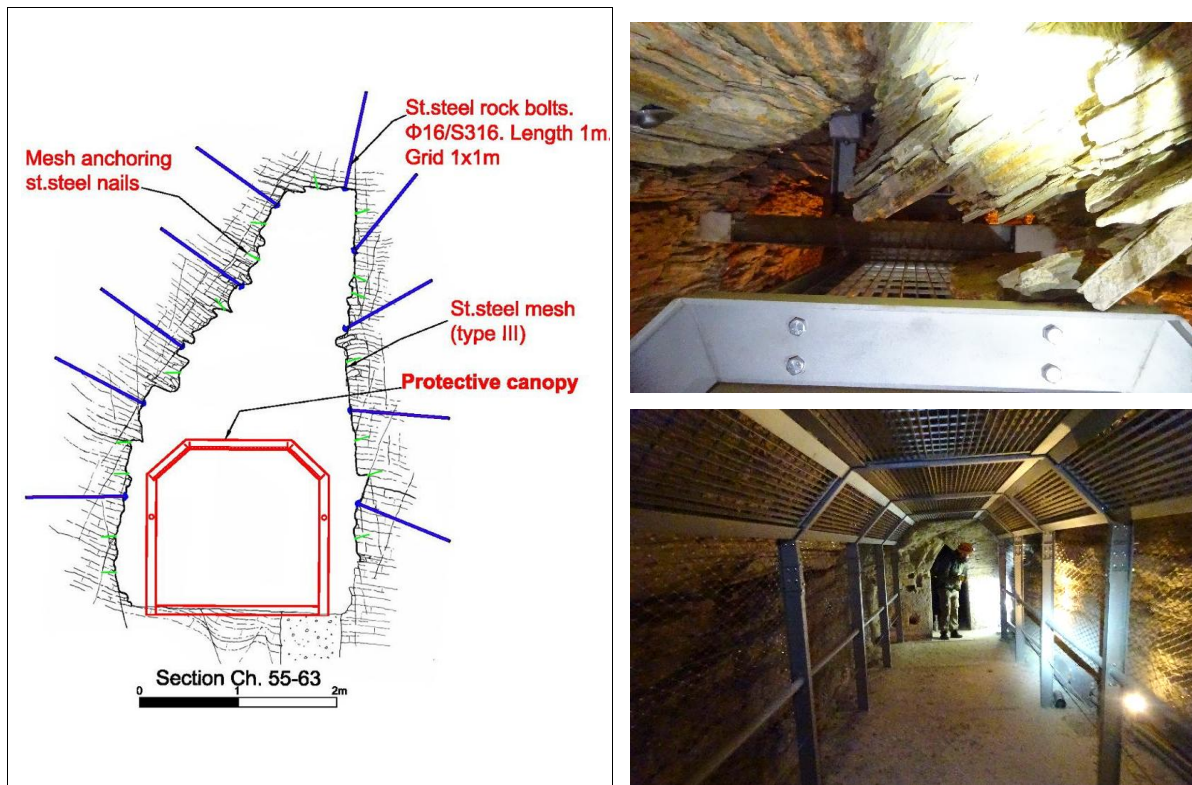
Cross section detailing the protective canopy and the rock support measures at the section between Ch. 49 and Ch. 63.7 (left). View of the installed canopy during the 2026 inspection (down right). Detail illustrating canopy protecting the visitor walkway from active rock falls (up right).
